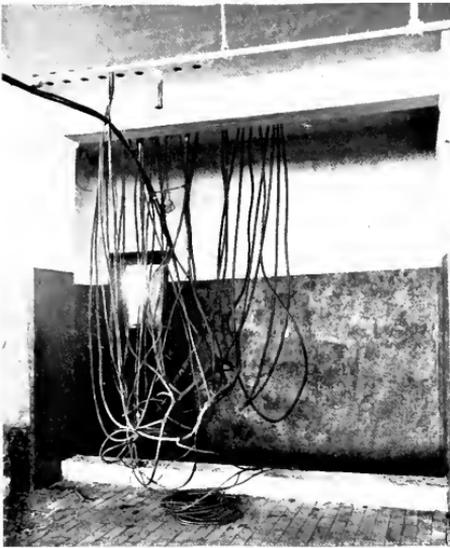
Looking into Switchboard Room Through Switchboard Opening
